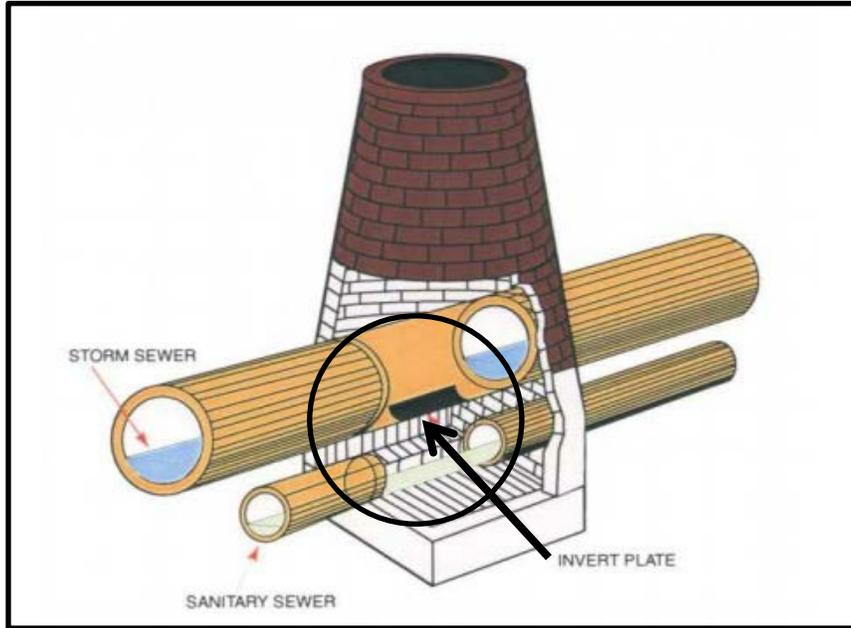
Common Trench Over-Under (Invert Plate) Sewer
